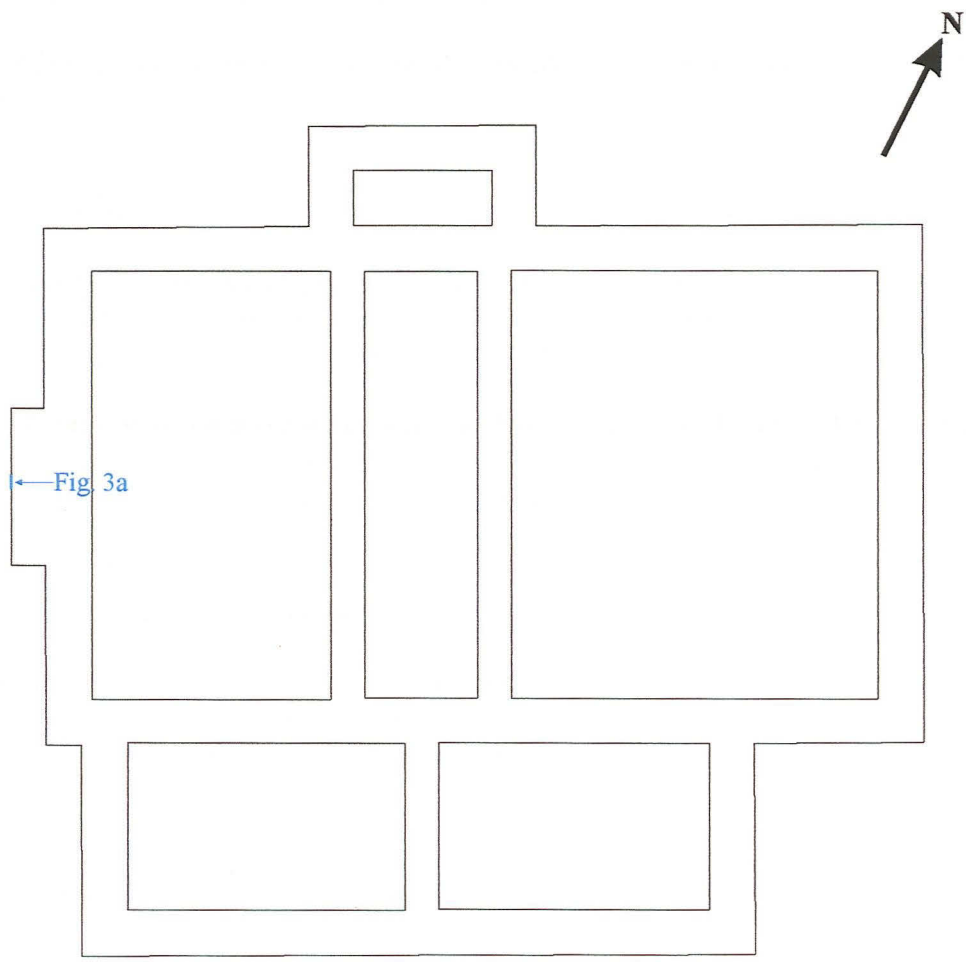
Layout of Plot 2 foundation trenches, showing location of sample section (fig. 3a) (scale 1:100)
